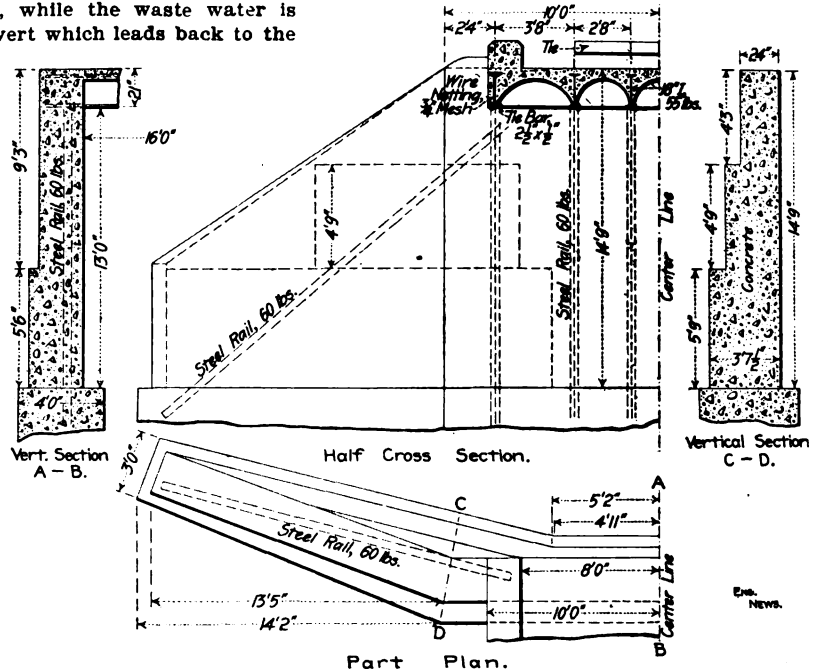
CONCRETE-STEEL BRIDGE WITH CONCRETE JACK-ARCH FLOOR.
